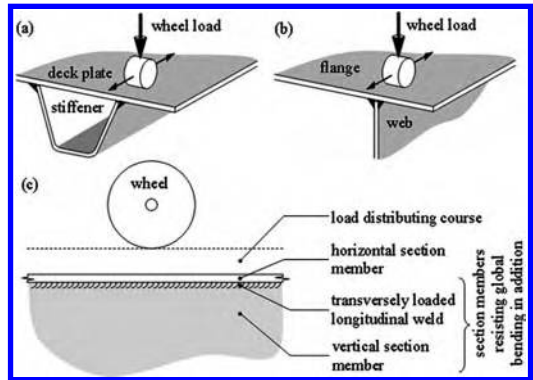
Load application into a steel deck (a) and a crane runway girder (b), schematic load application section (c).
